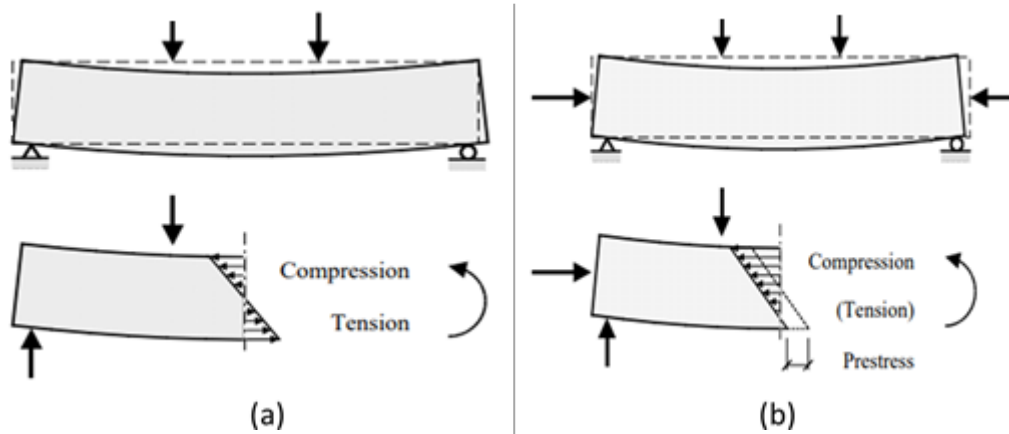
(a) Concrete member subjected to bending without prestress; (b) concrete member subjected to bending with prestress- tensile strength reduction[13]
